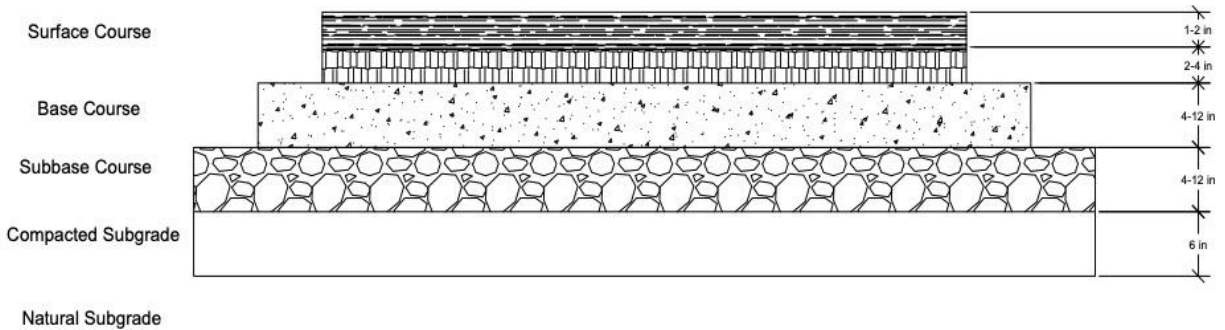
Typical section for a flexible pavement (Imtiaz, 2021)
